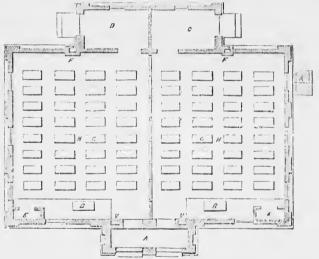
GROUND PLAN OF DESIGN NO. 30.
